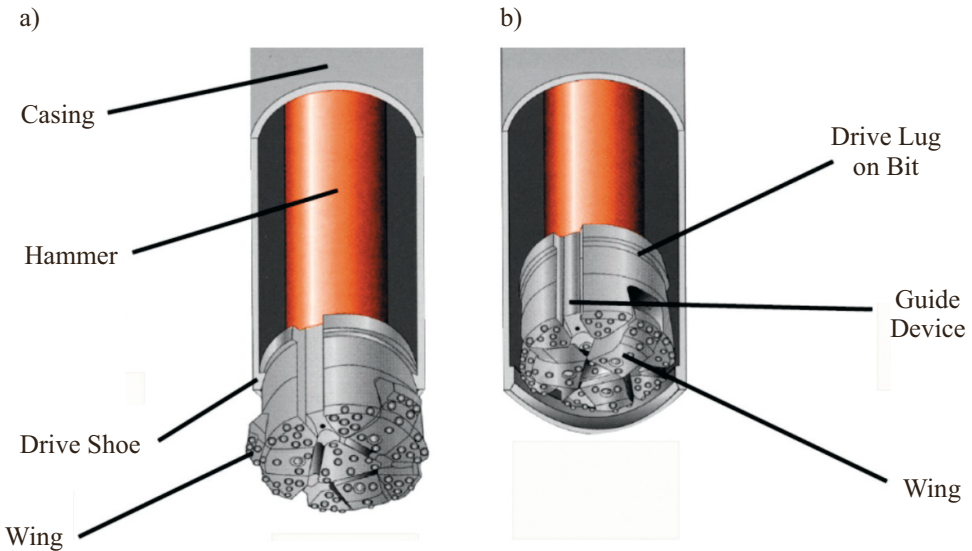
View of a set for drilling a well with simultaneous casing using a symmetrical drill bit with extendable blades [10]: a) drilling position; b) retracted position
